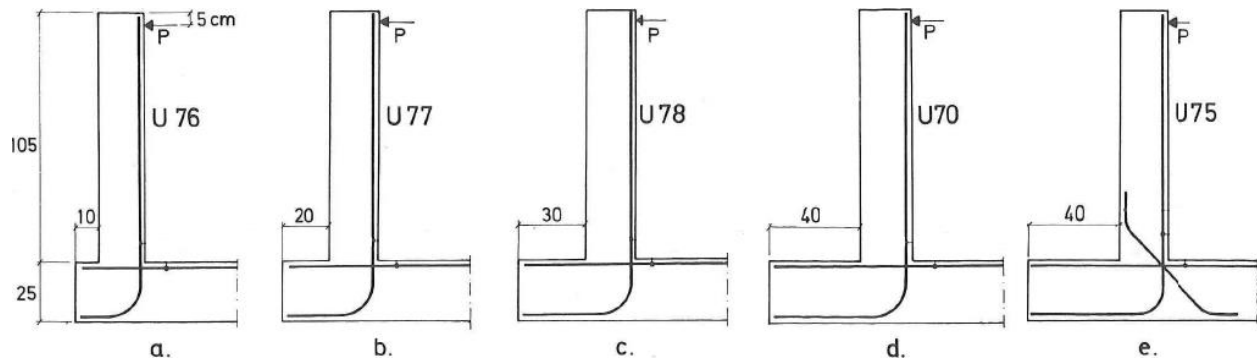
Dimensions of cantilever retaining wall variants (Nilsson, 1973)
